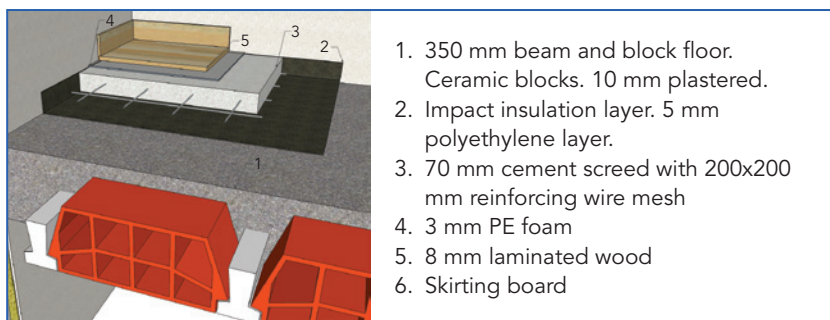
Example of a typical Spanish floor. Beam and block floor with a floating floor consisting of a screed on a polyethylene layer.
